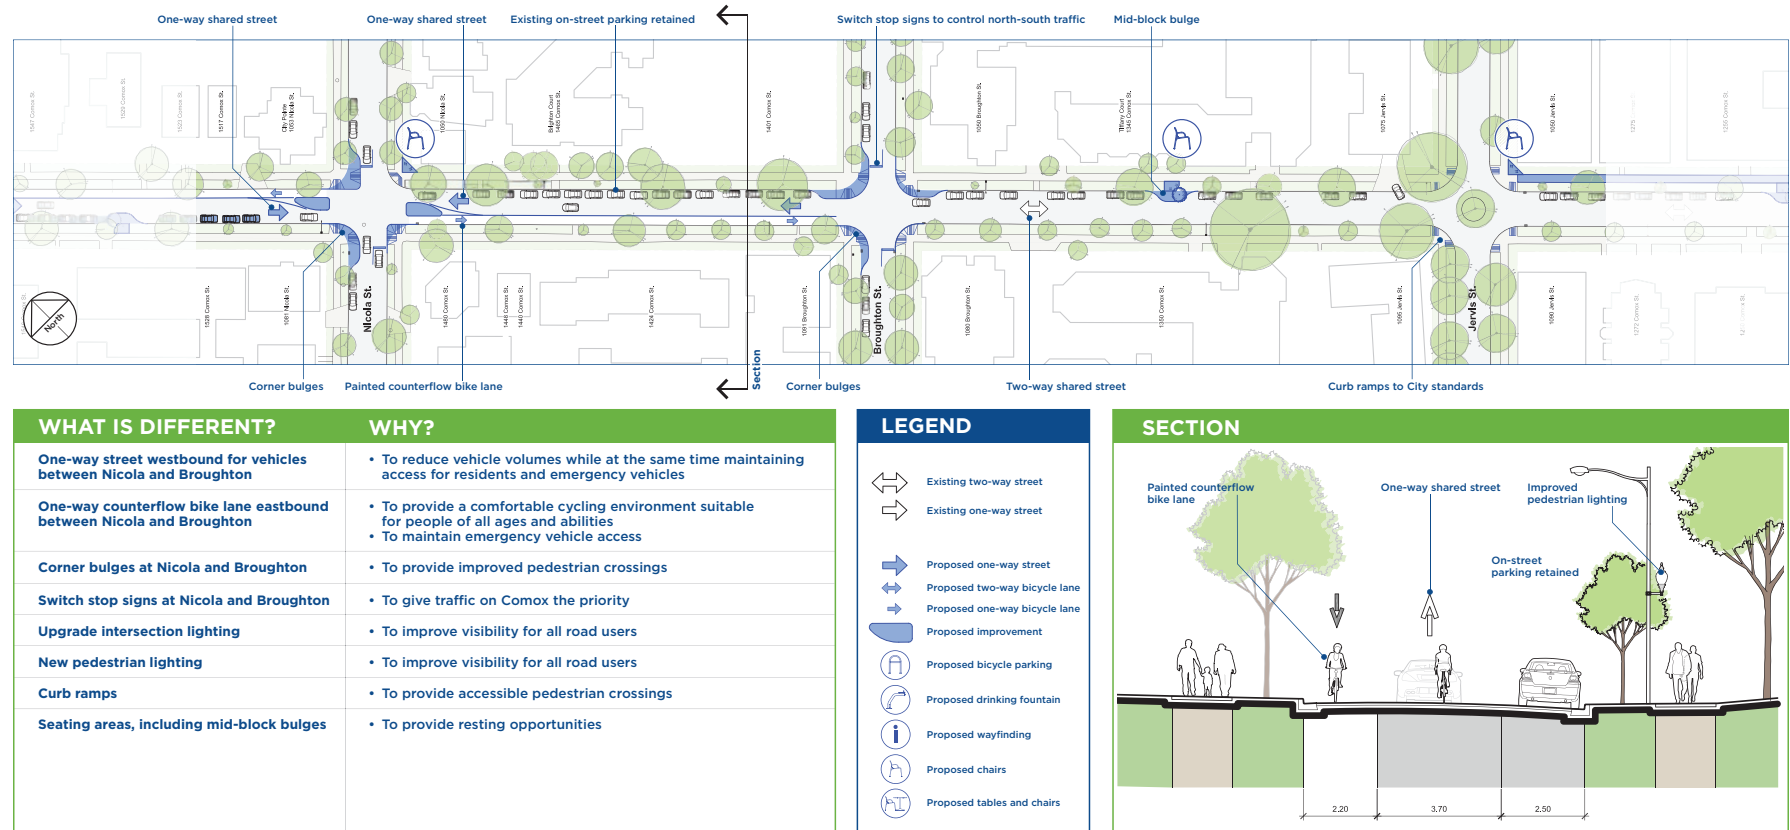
Plan and section view of improvements for Comox Street from Jervis Street to Thurlow Street.
